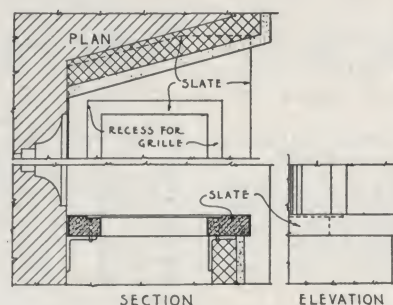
Typical Detail of Perforated Slate Sills with Radiators Under in College Buildings by Cram & Ferguson, Architects, Boston, Mass. Slate 1 1/2 inches thick cut out for metal grille with 1/4 inch recess and supported at front and back by angles or channels to which both grille and plate are fastened with machine screws. Slate bedded on metal only if necessary to level up and ends of slab run into hollow tile or other furring as indicated. All arrises sharp.
